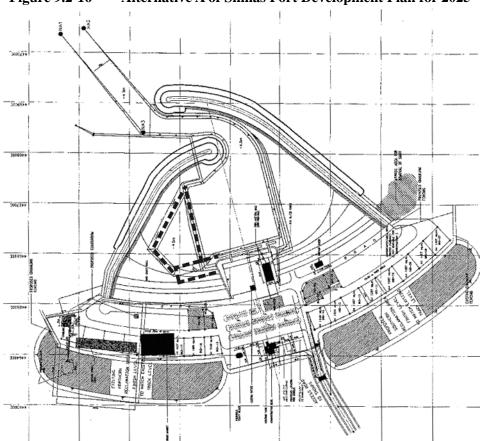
Alternative A of Shinas Port Development Plan for 2025
